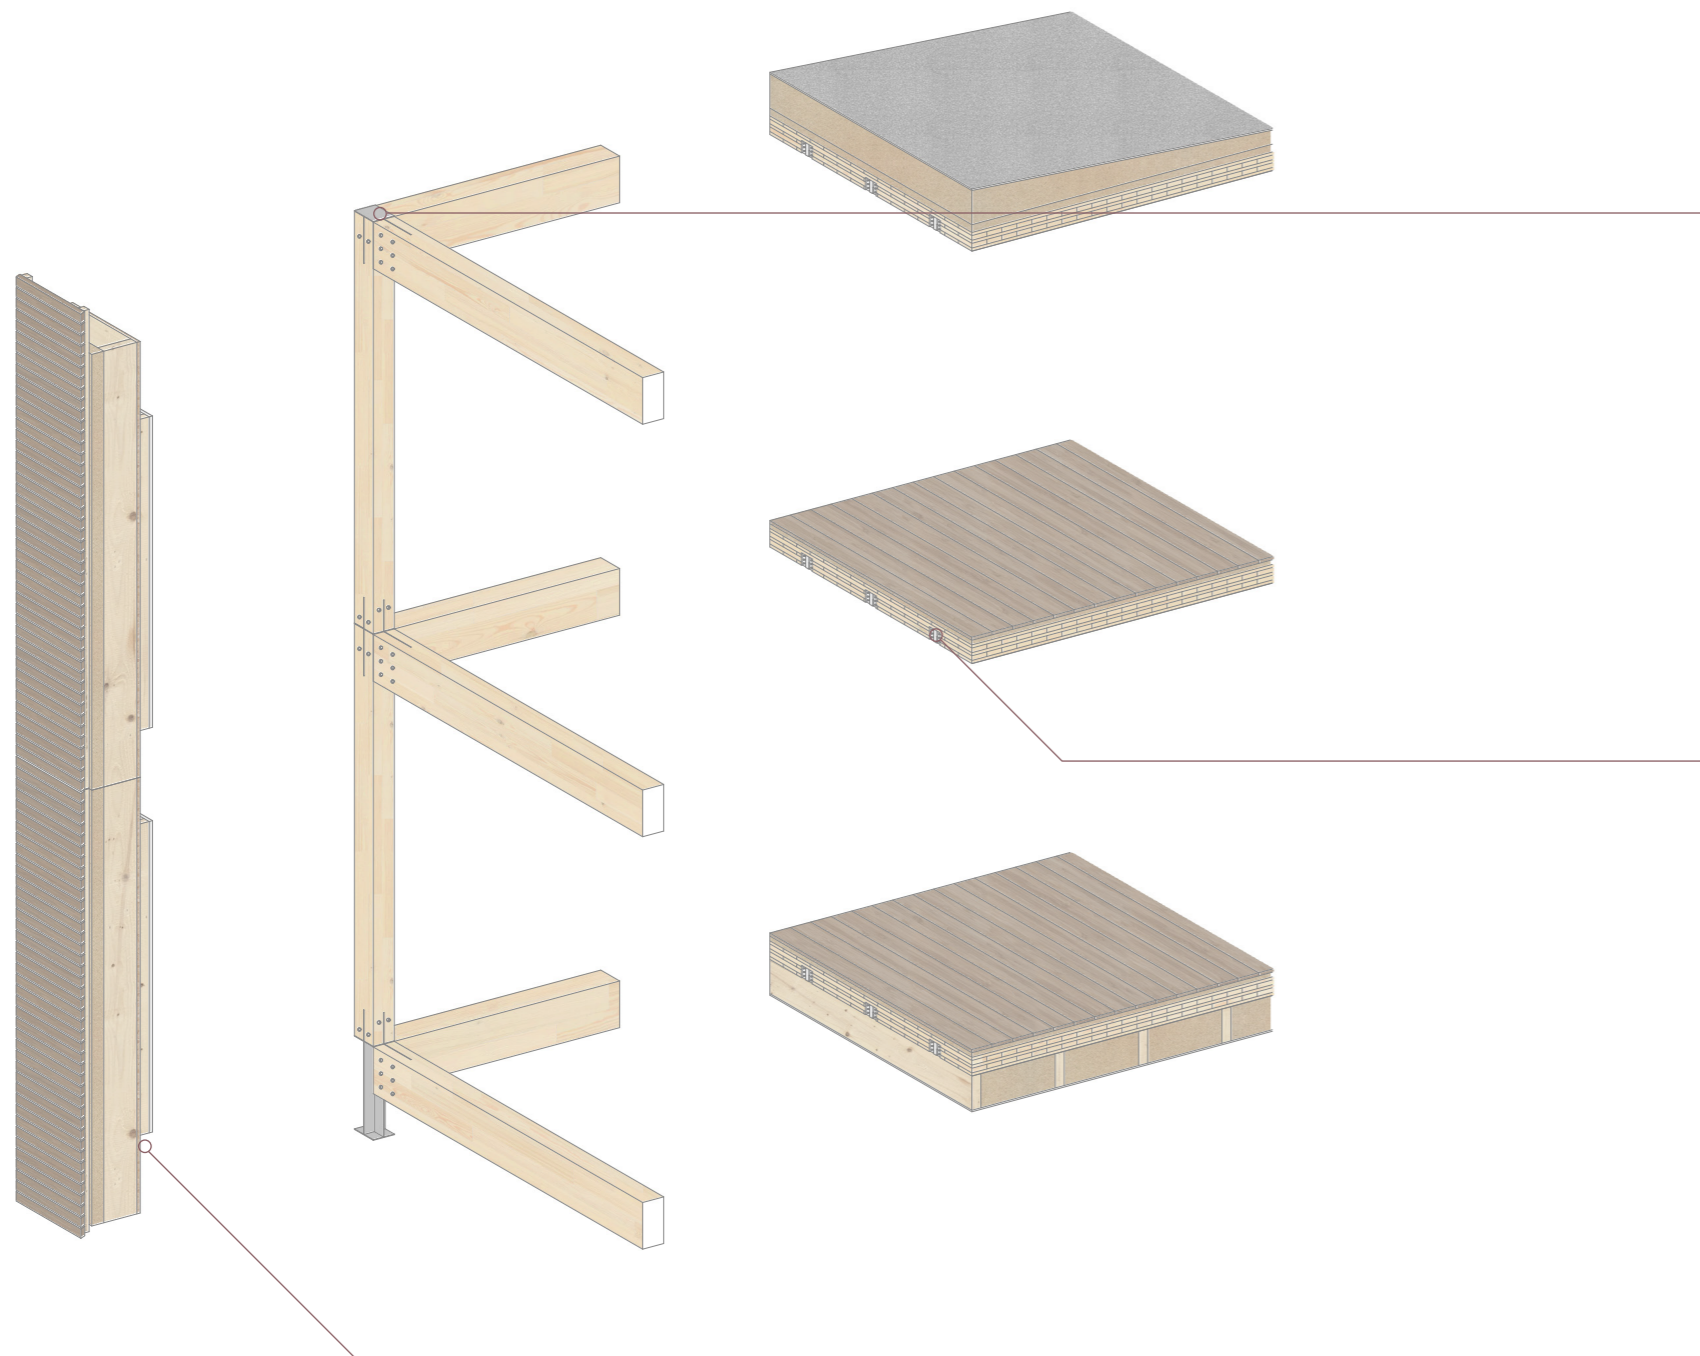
Drawing, Axonometry building system exploded. ©Personal illustration.
